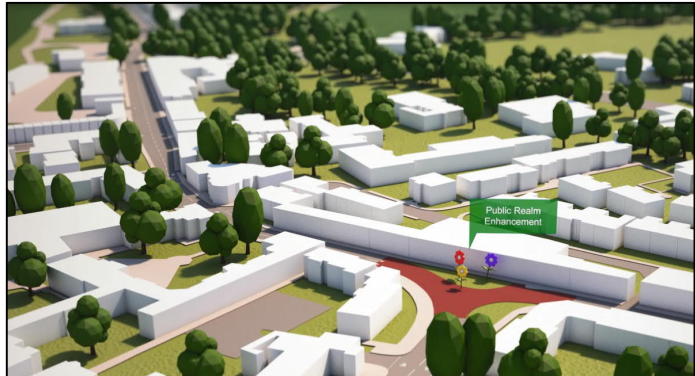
James Street and Millhill to become a quiet street with raised tables at junctions. All parking would be kept
